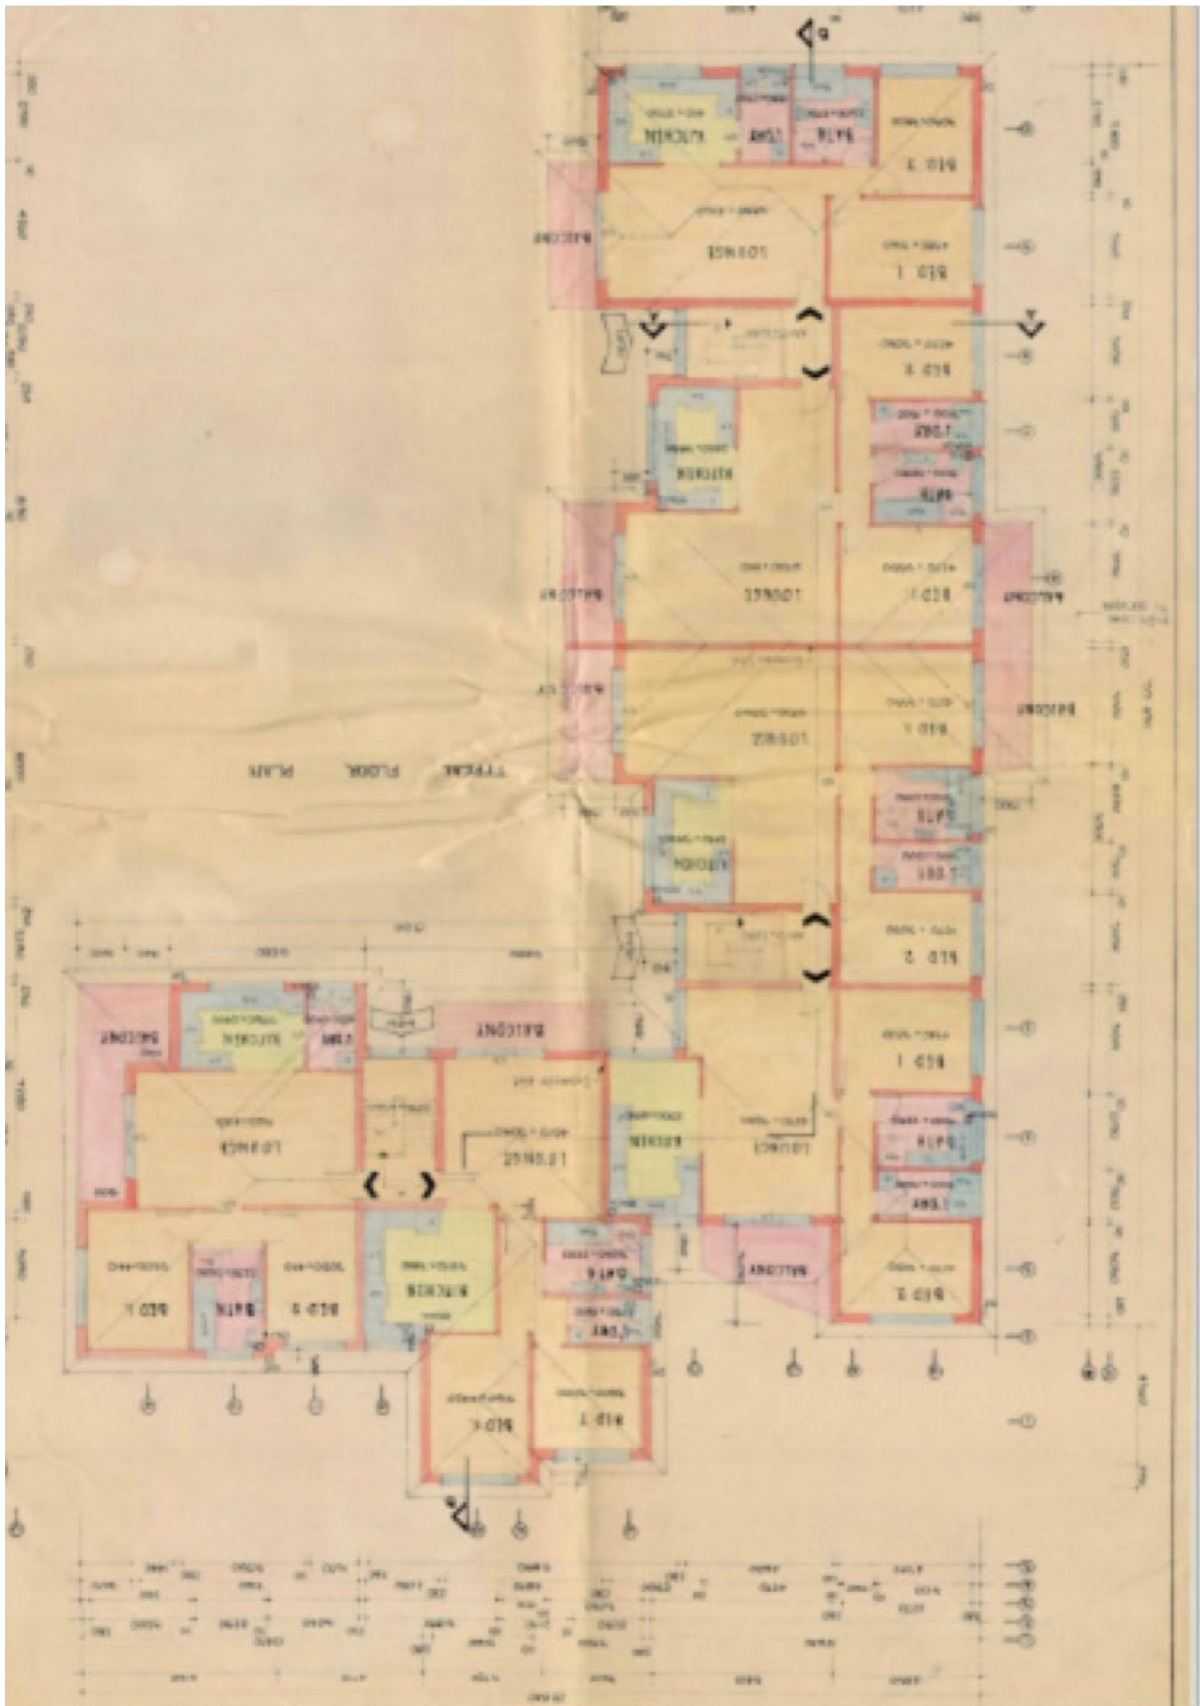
Floor plan of residential flat building at no. 44-48 Milton Street.
